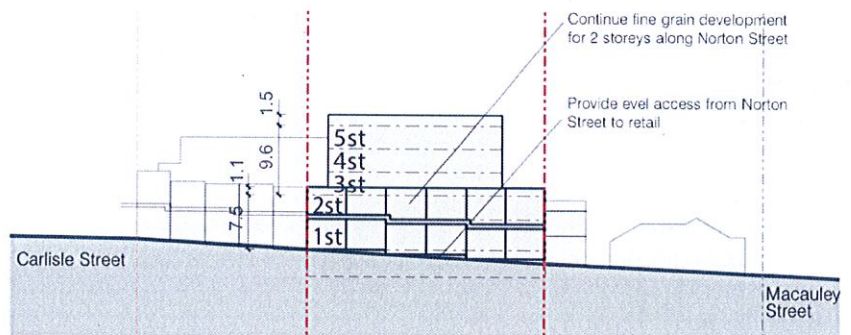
Norton Street _ Building envelope _ Street Elevation B-B
